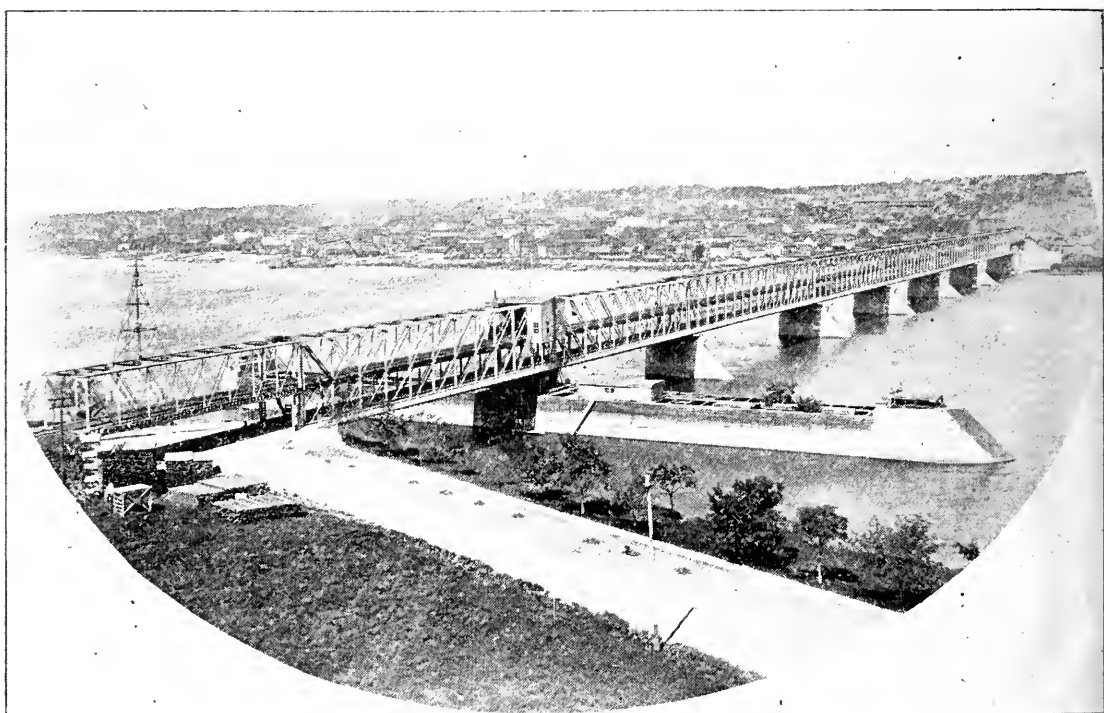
SECOND BRIDGE AT ROCK ISLAND, C. SHALER SMITH, CHIEF ENGINEER. BUILT BY THE PHOENIX BRIDGE COMPANY IN 1870.
